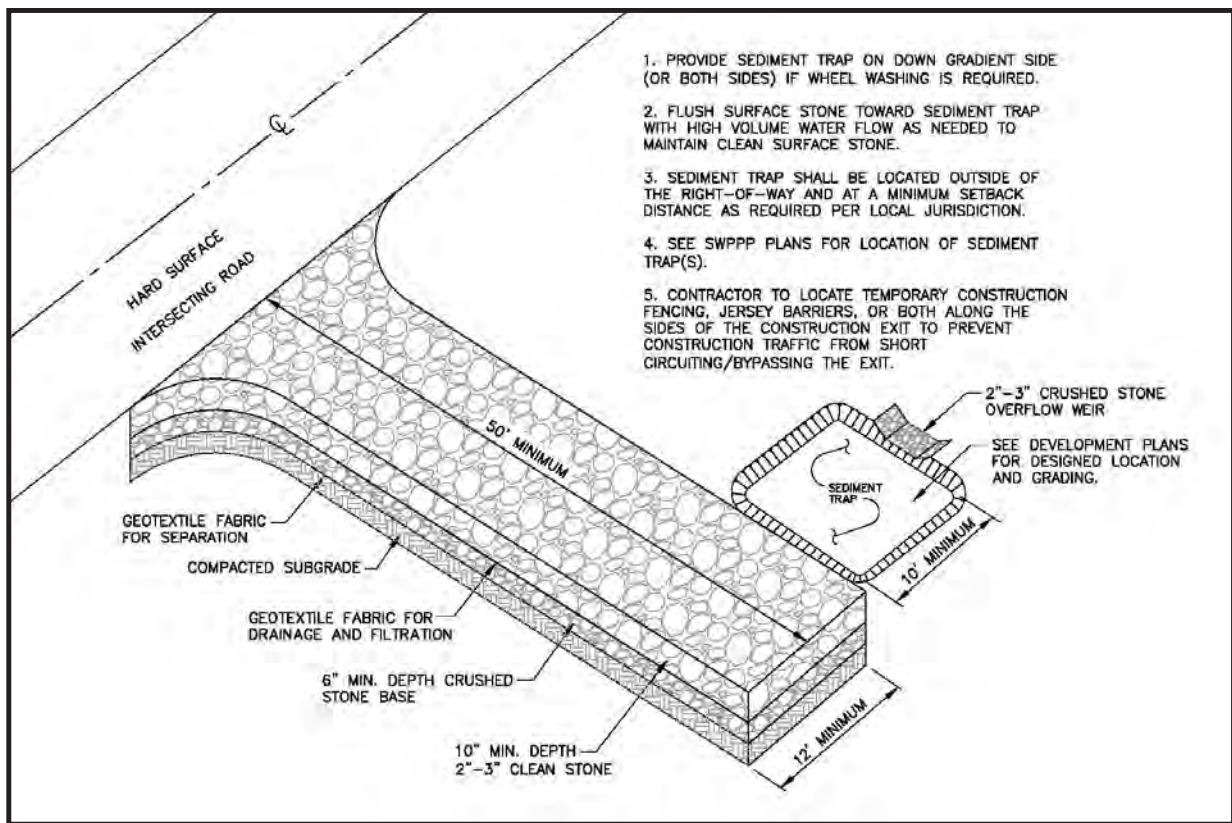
Typical Temporary Rock Construction Exit. Source; BFA Inc.
